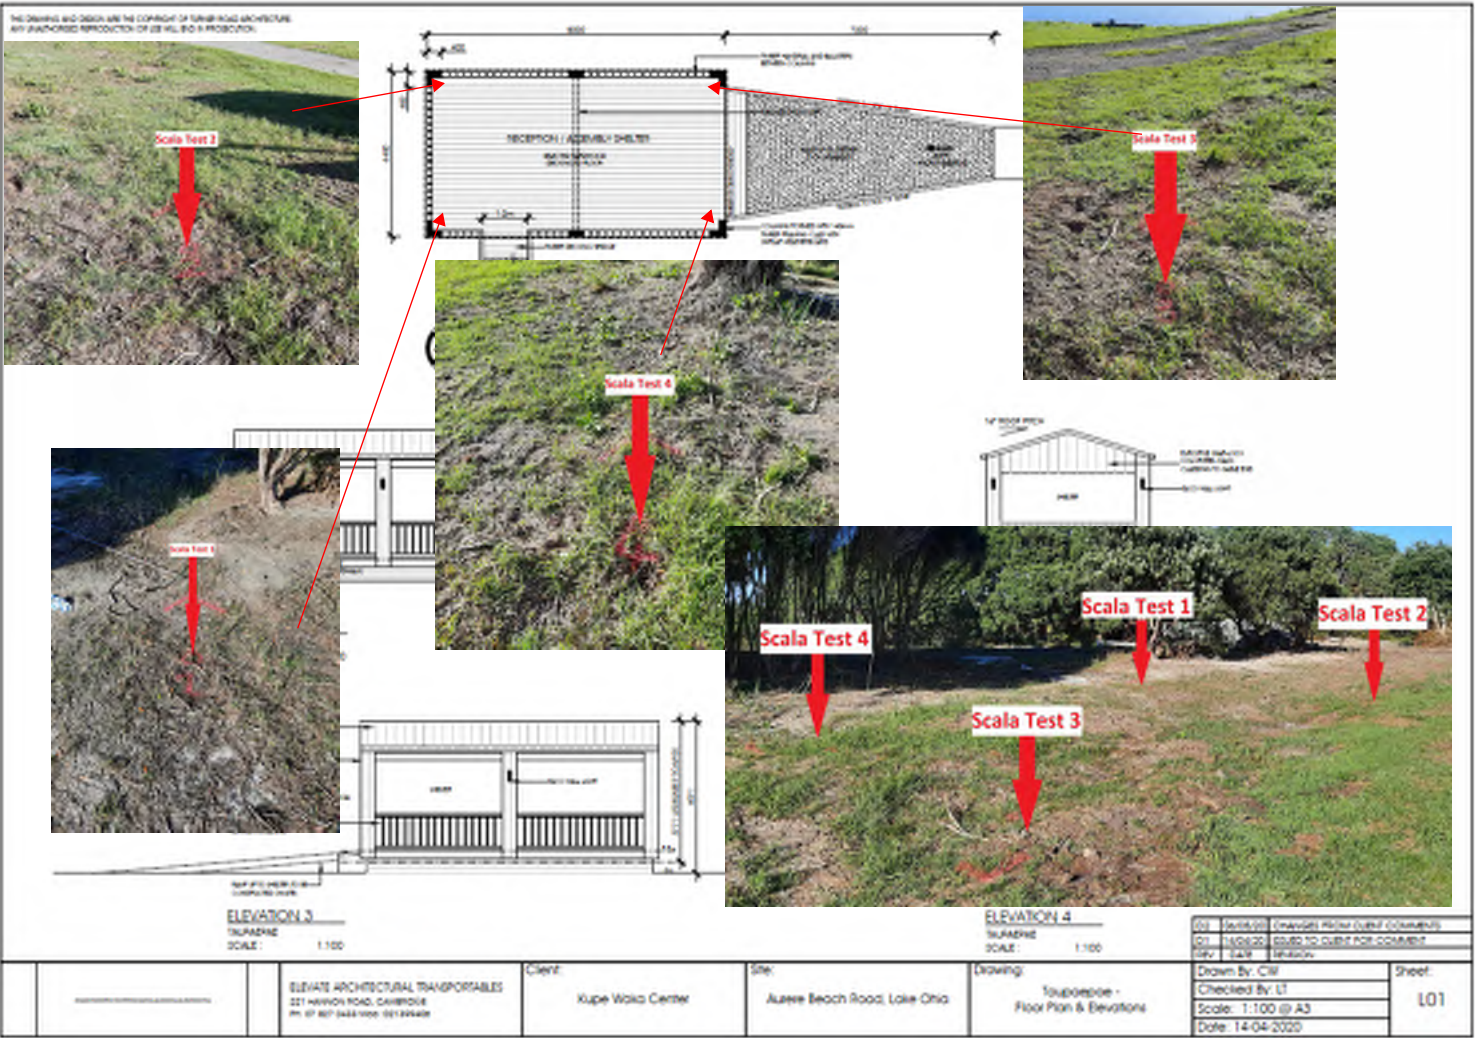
Taupae floor plan with scala test locations shown, and pictures supplied.
